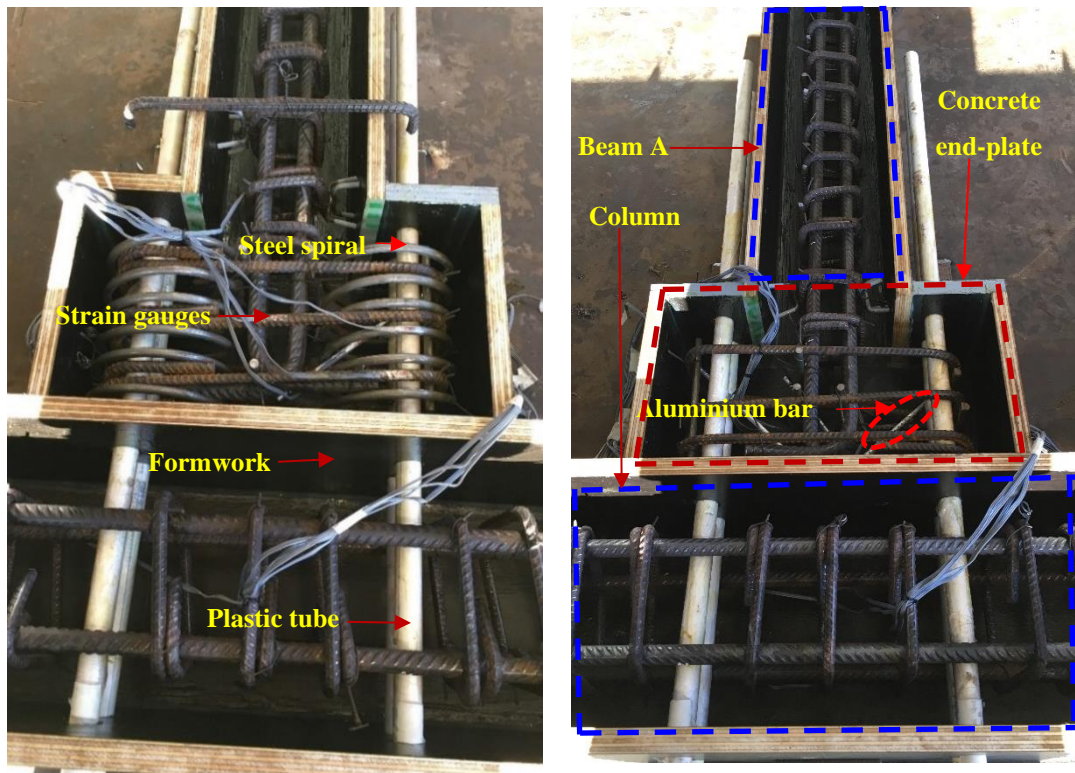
Details of the reinforcements, strain gauges, aluminium bars, formworks, and plastic tubes.
